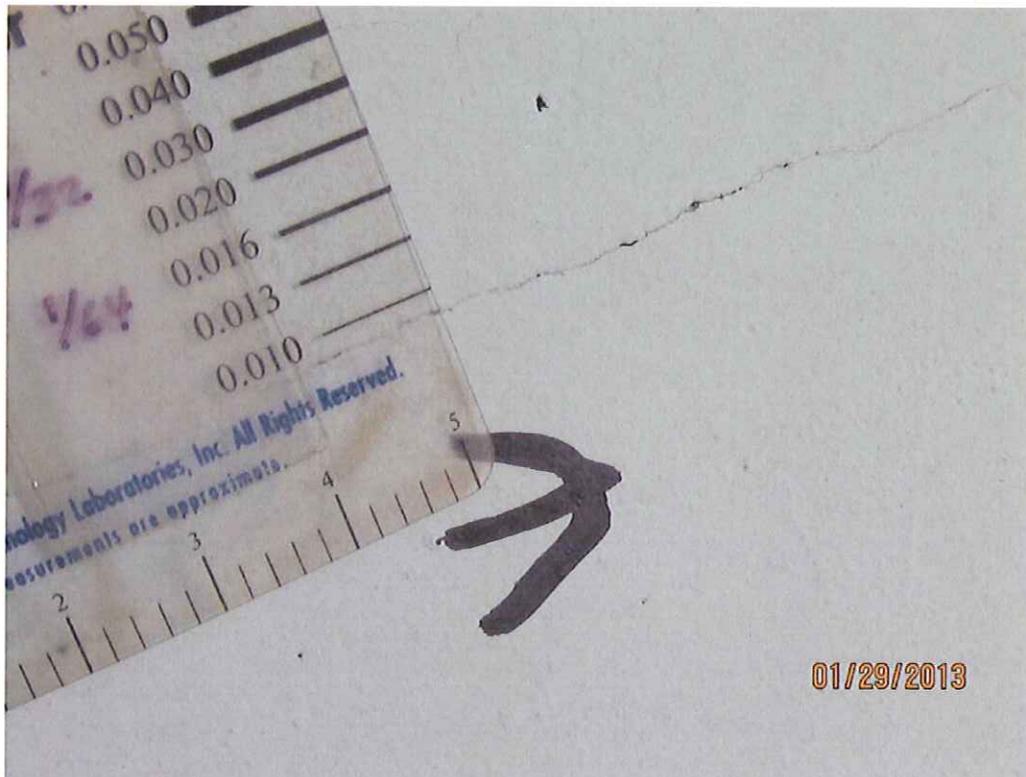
Typical crack width in the bottom flanges and beam webs
